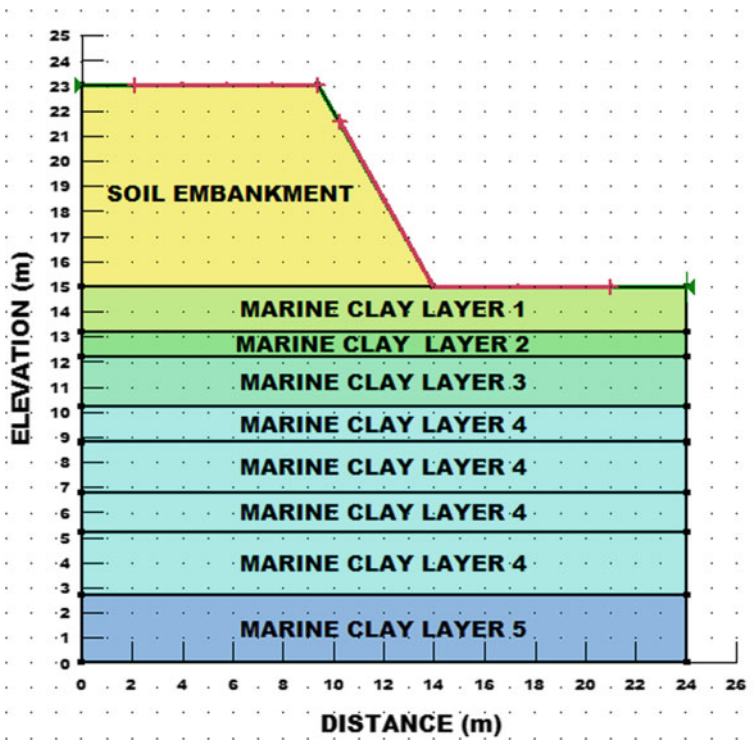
Soil embankment of 8 m height and slope of 60° subjected to seismic loading with soil profile details up to 15 m depth
